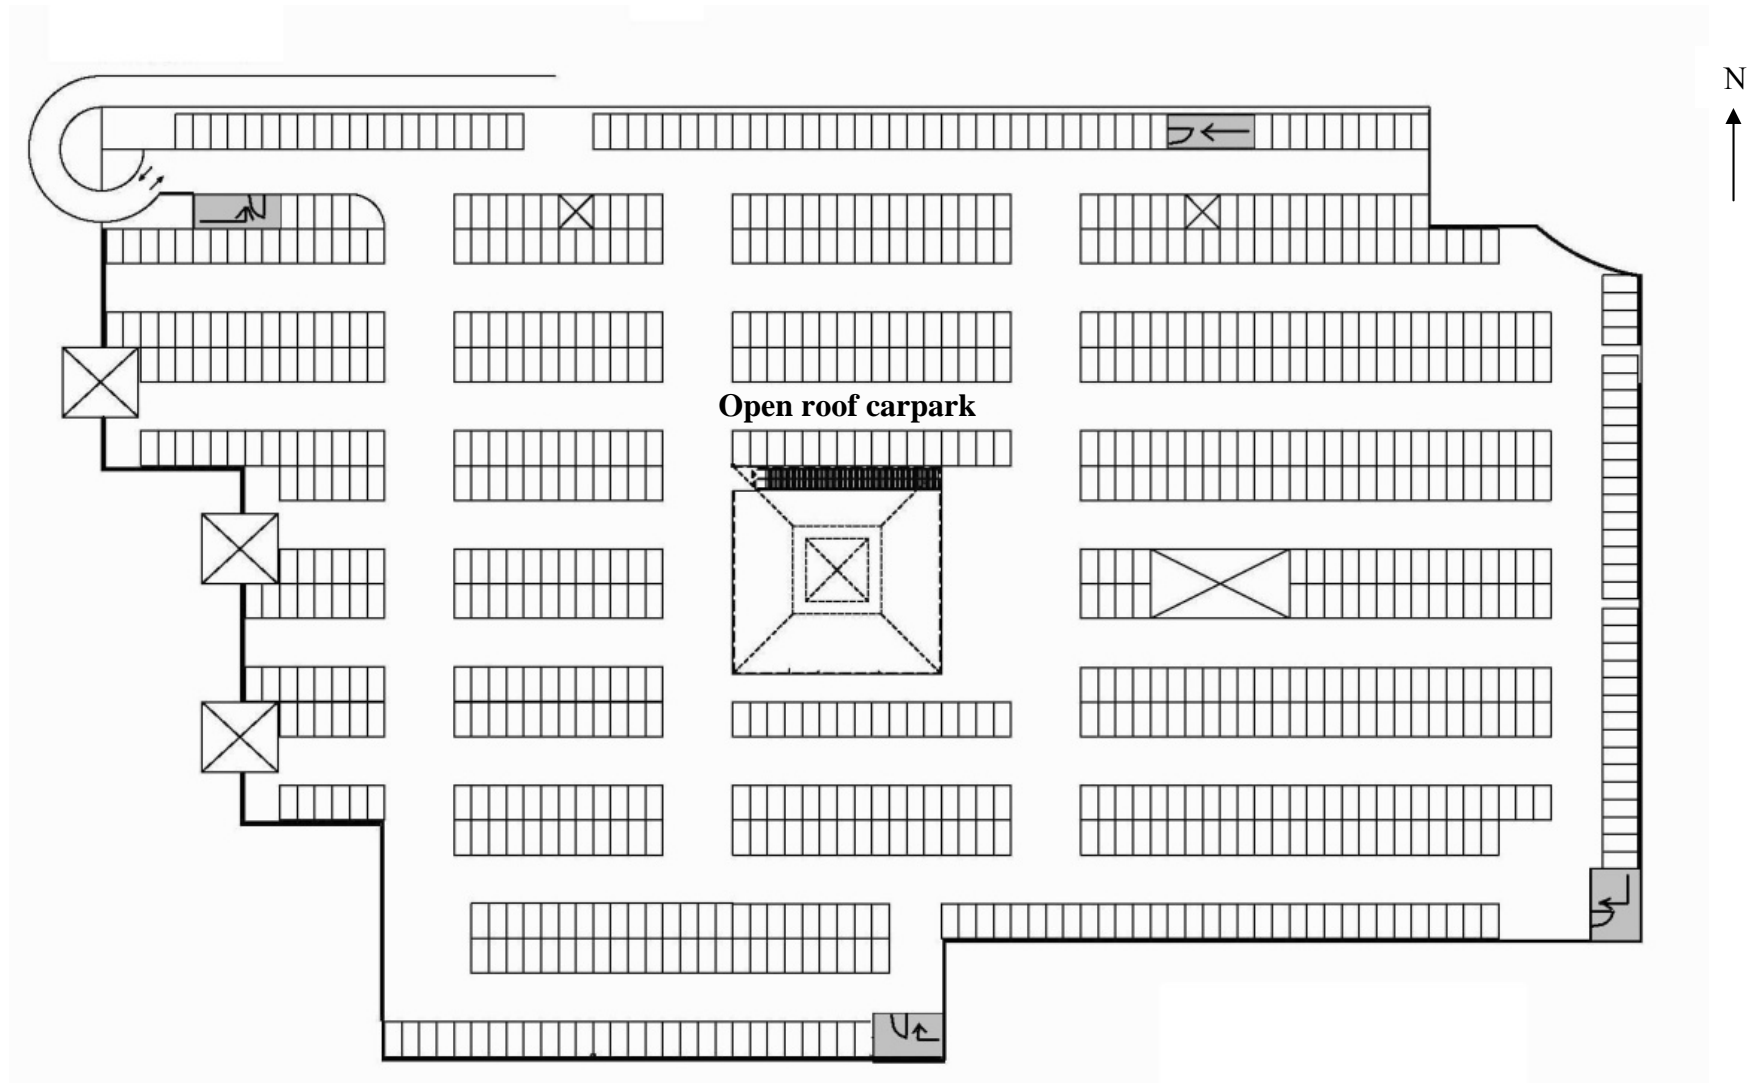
Plan view of floor 4 in shopping mall (not to scale)
